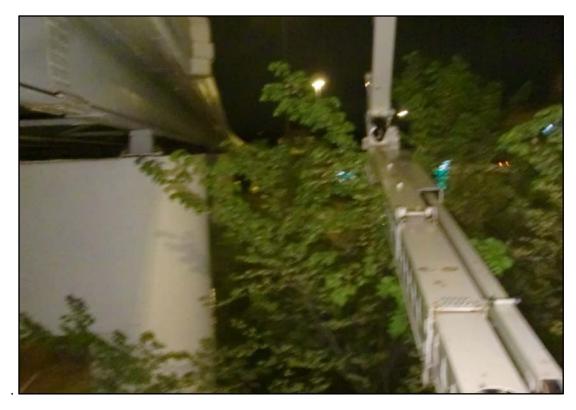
Tree Growth within I-71 Median Obstructing Snooper Access.
